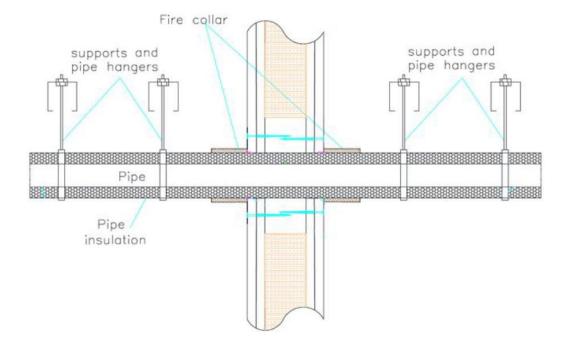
General arrangement of metallic pipes protected with Protecta FR Collar installed at both sides of the wall
